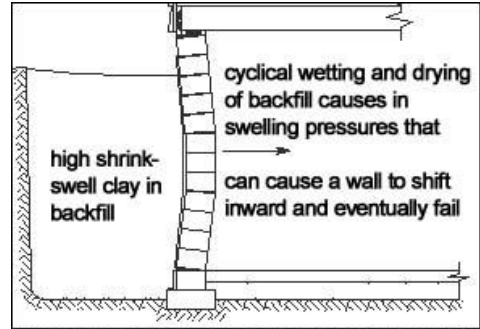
Foundation wall damage caused by high shrink-swell clay in backfill
